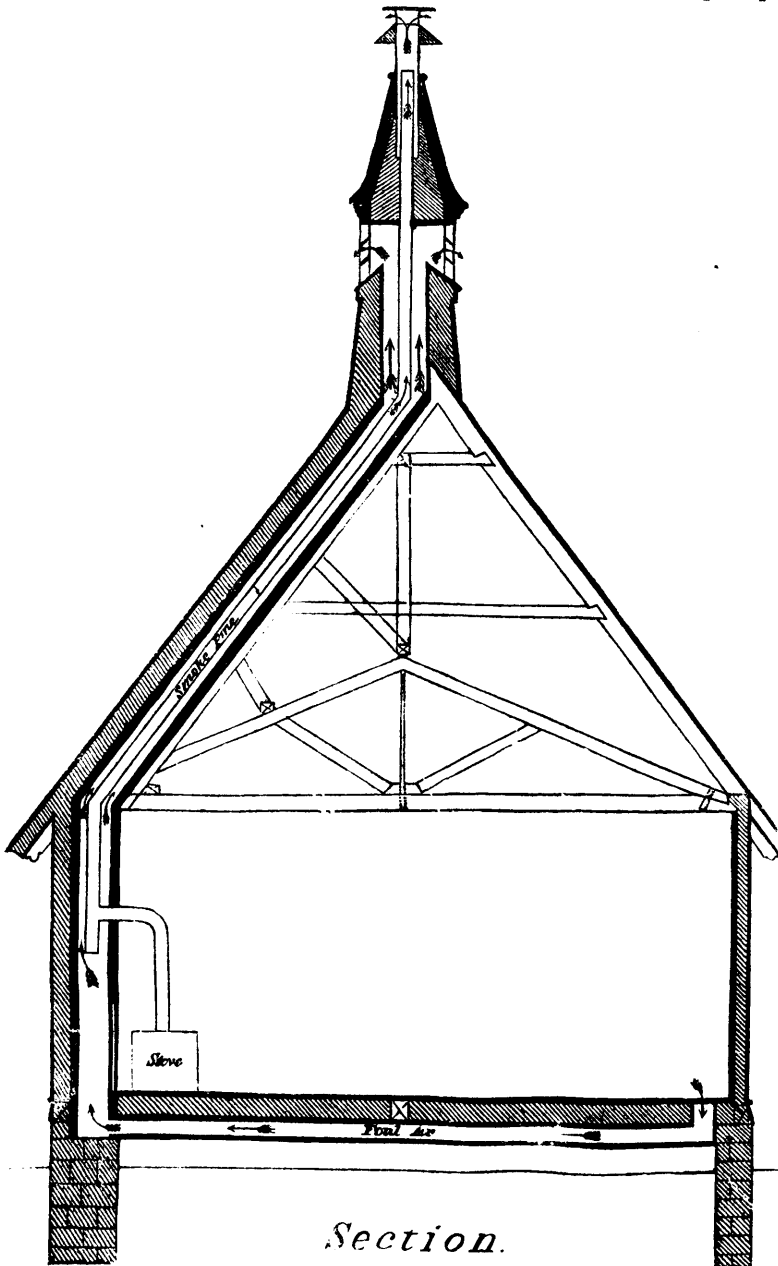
SHOWING ARRANGEMENT OF HEATING AND VENTILATION.
